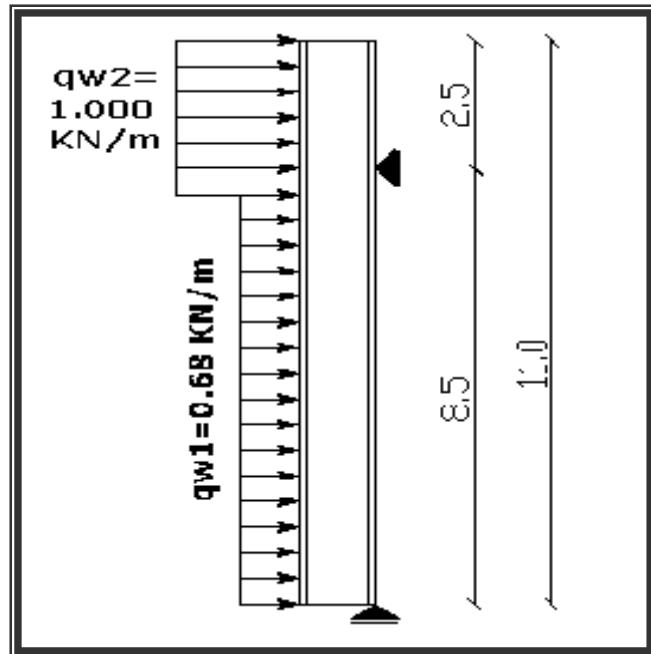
System and loads of concrete wall when Compression Force due wind load
